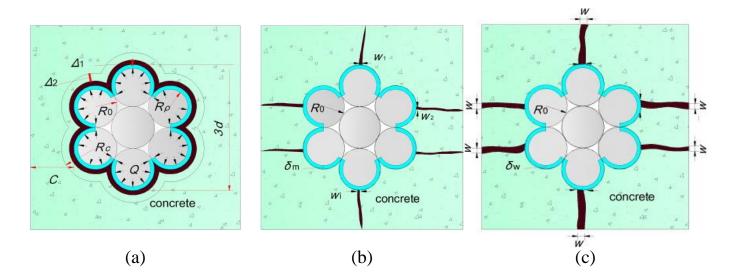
(a) Radial deformation at the strand-concrete interface (b) Schematic of cover cracking (c)Schematic of crack width Dai growth (et. al 2016)
